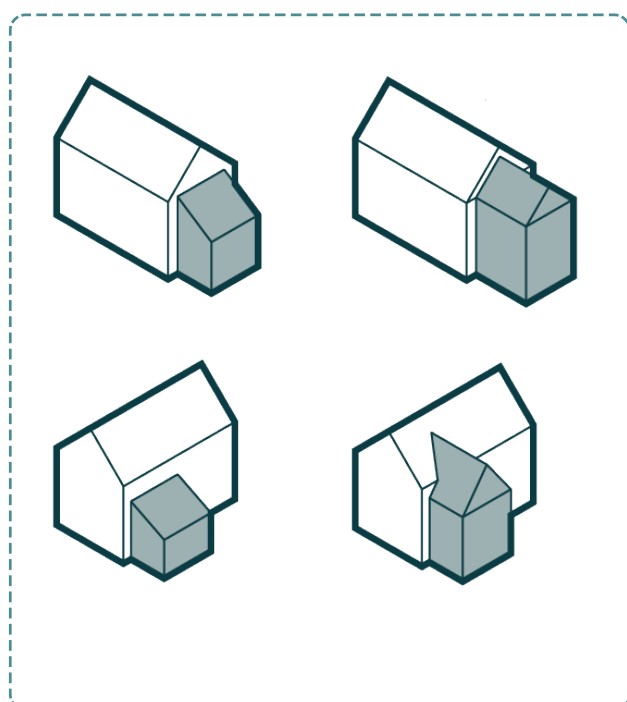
Examples of acceptable side extensions that respect the existing building scale, massing and building line.
